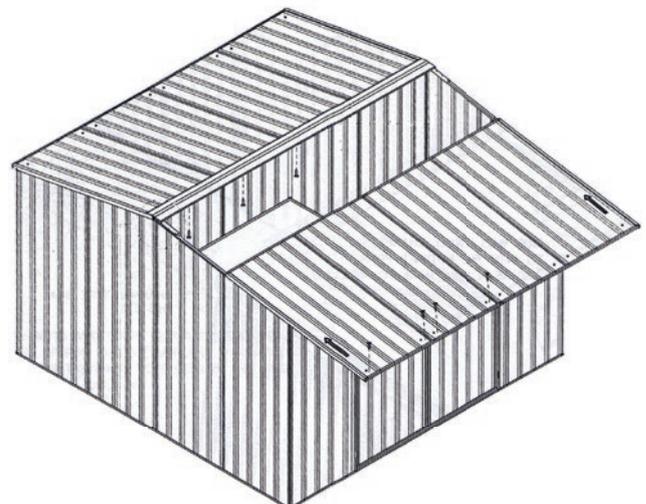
Screws required to be removed and the direction insulation should be placed.
